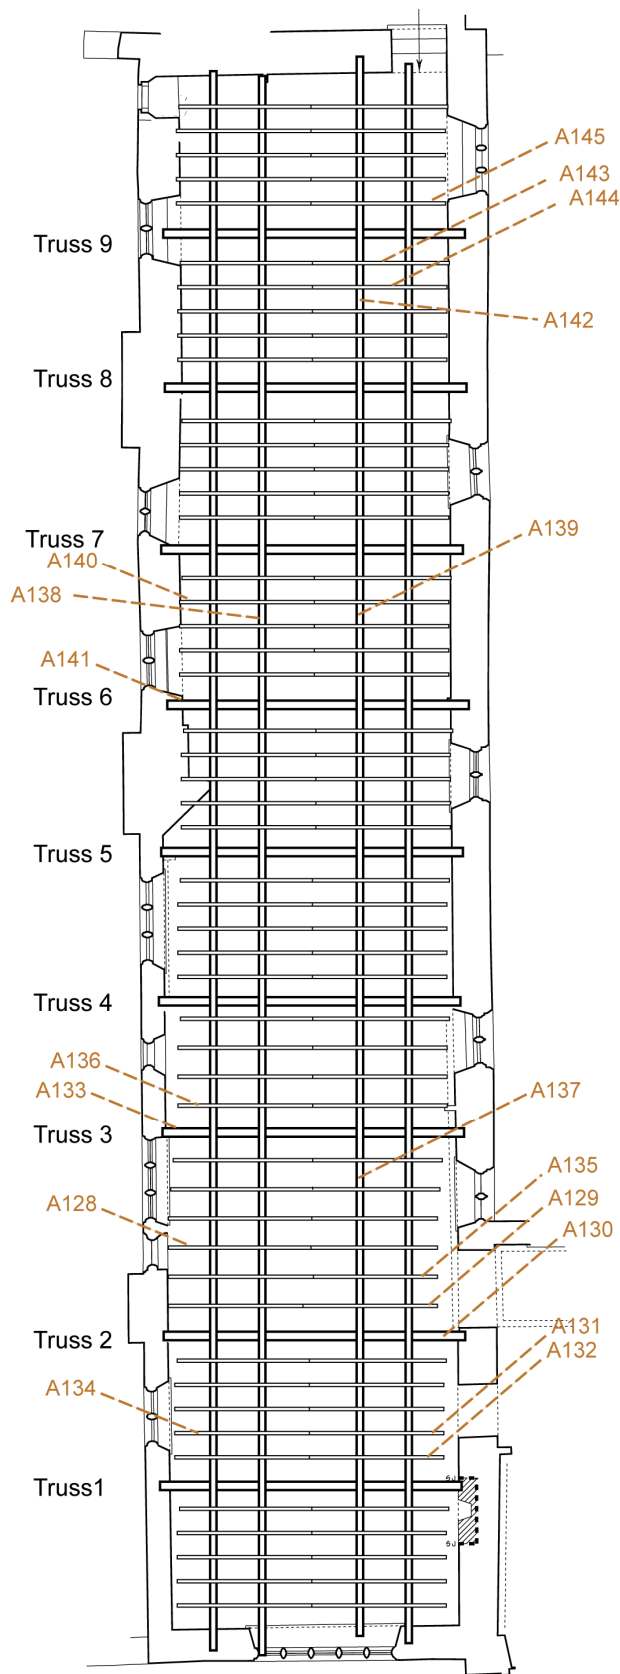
West range roof timbers, showing locations of samples APT-A128–45
